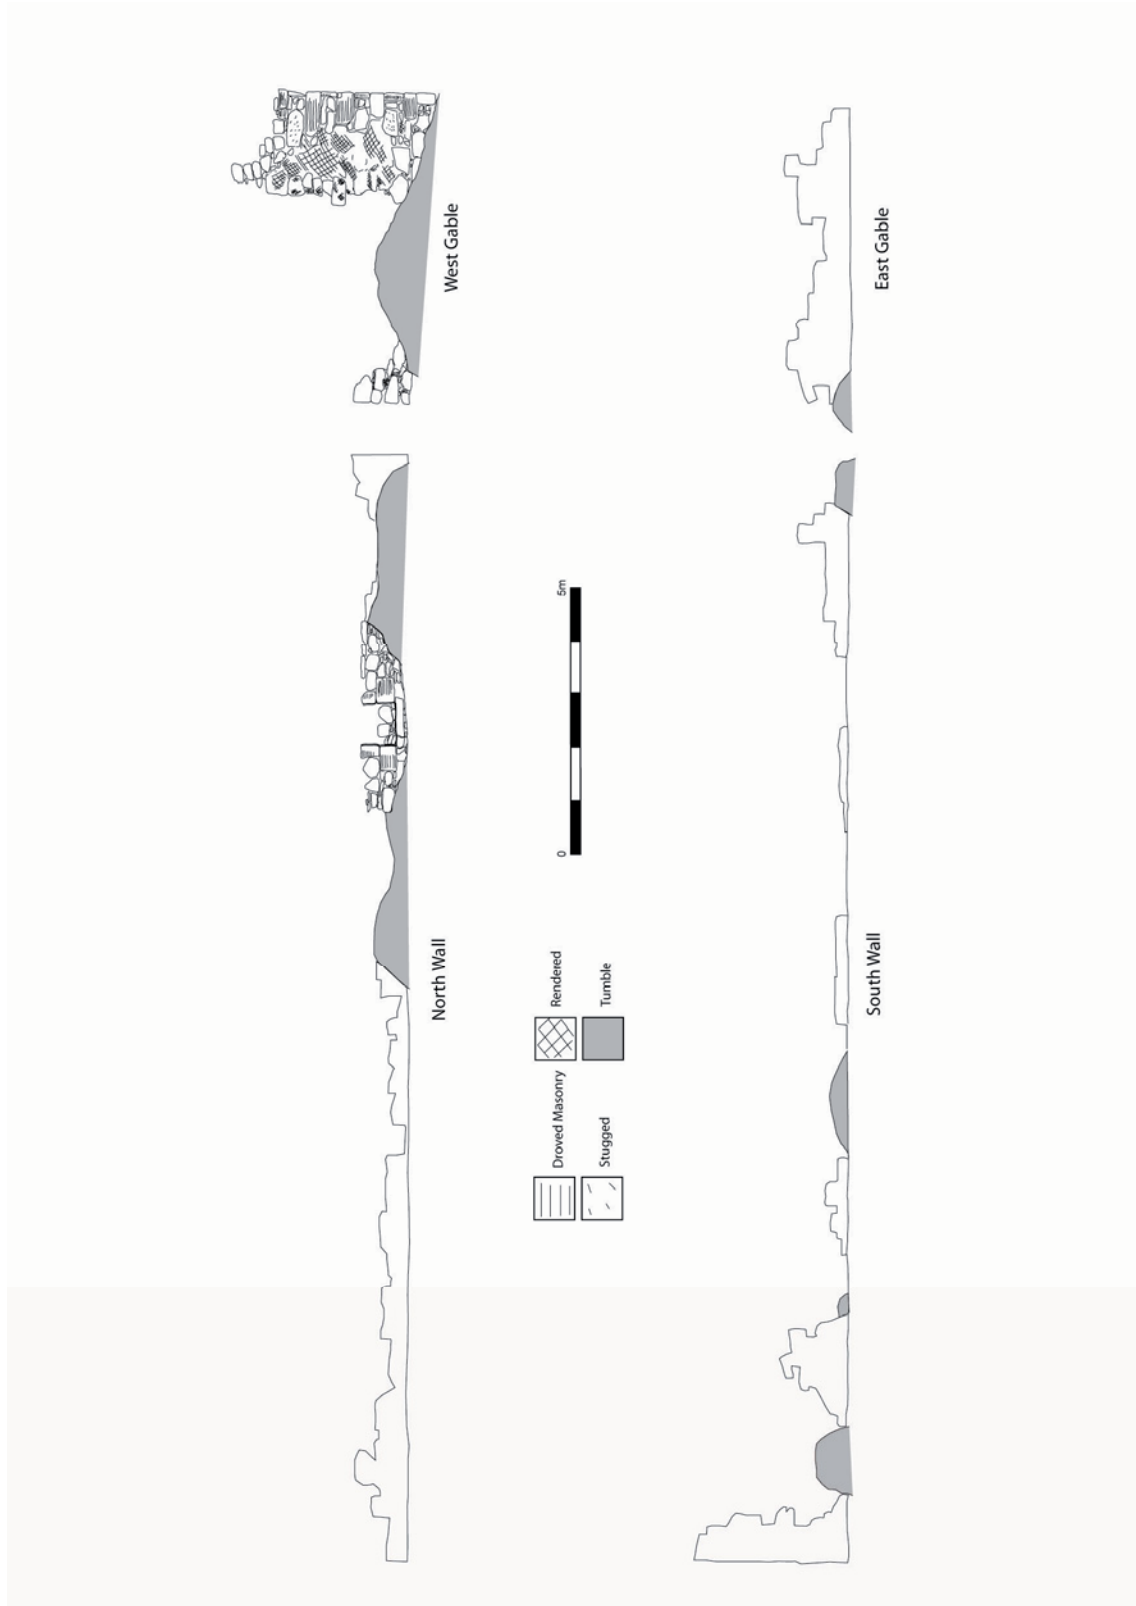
Surviving Elevations of Structure 202 – For Details of Masonry see W End of North Wall and W Wall
